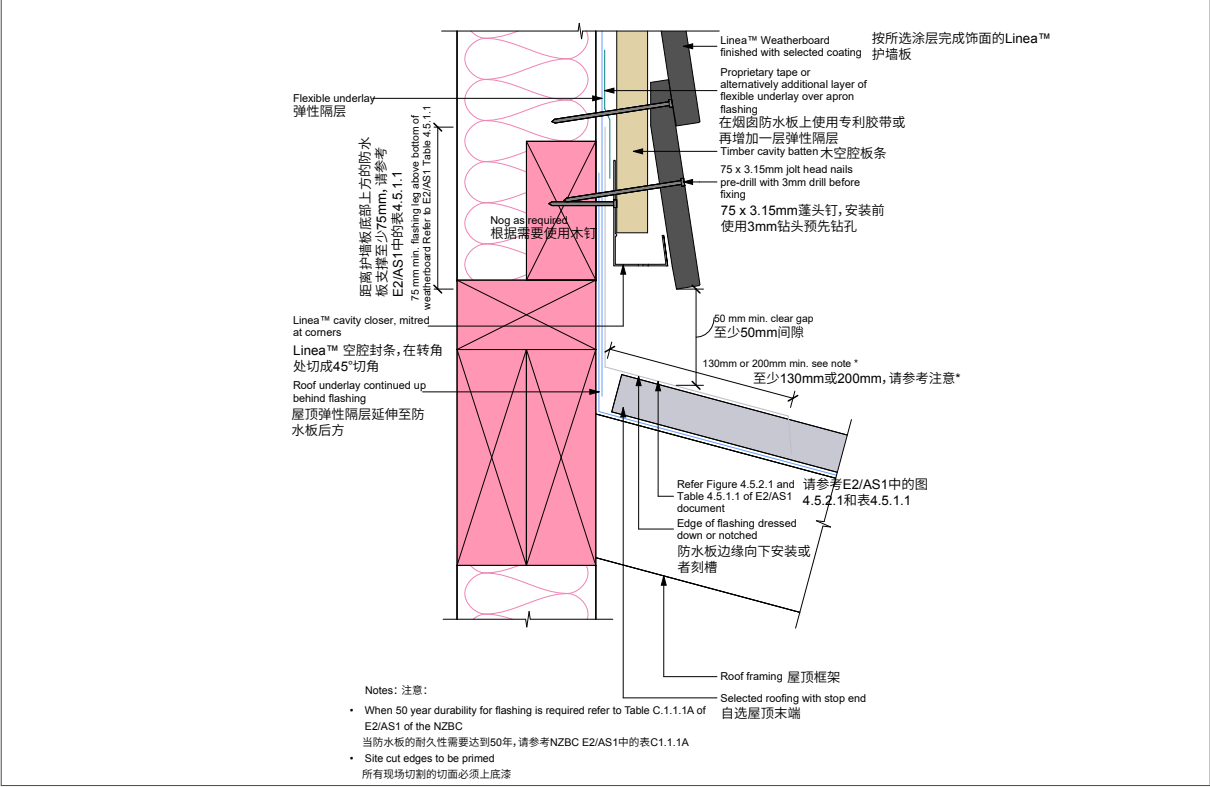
Roof to wall junction detail | 图 30: 屋顶与墙体连接详图
